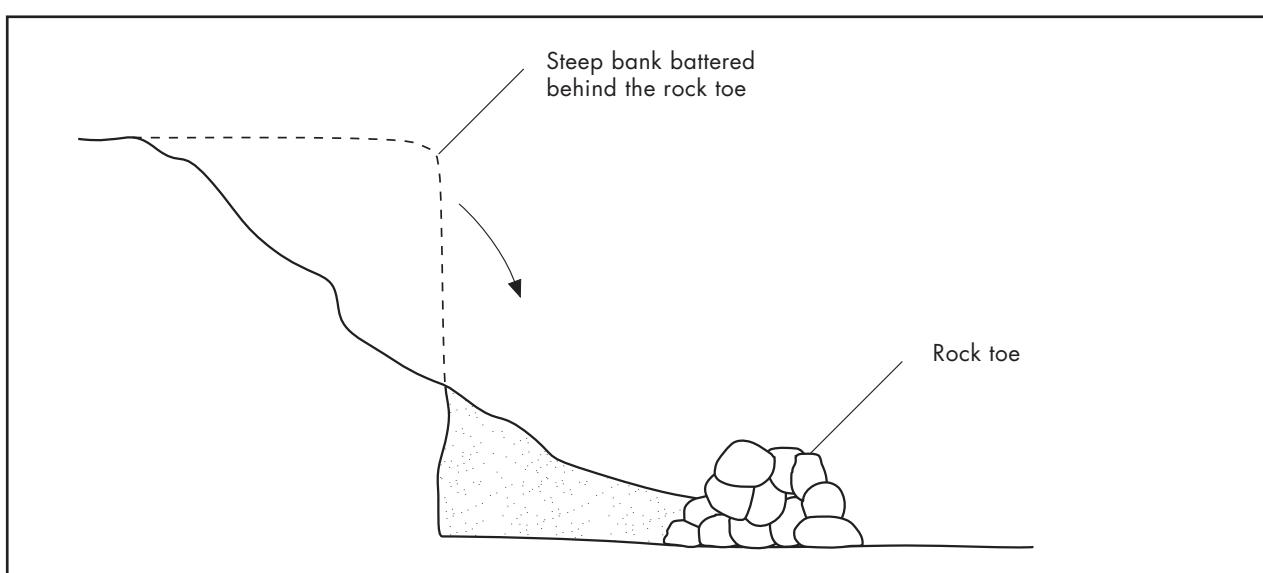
Toe protection constructed away from bank to allow natural bench formation.
